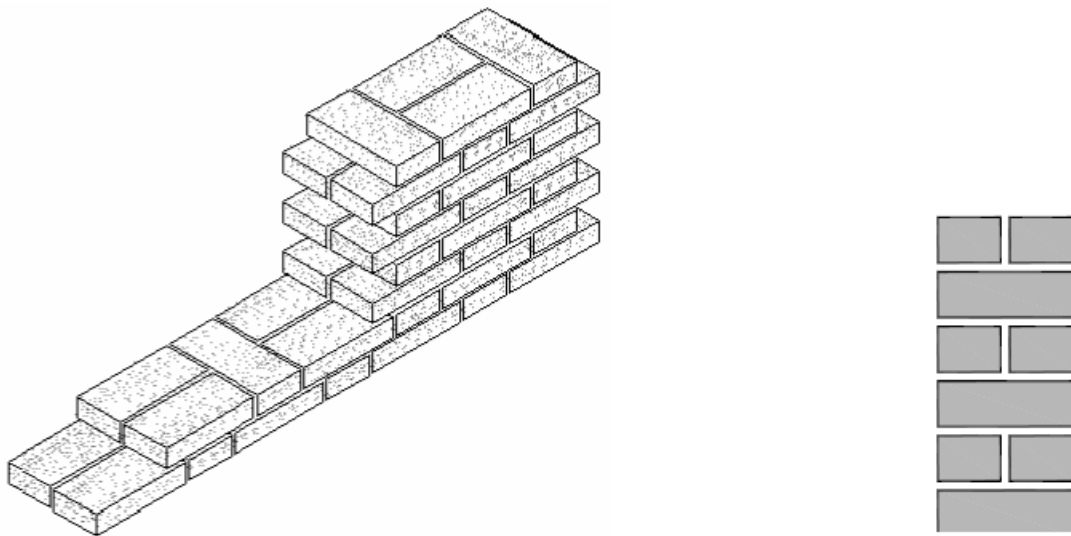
Sketch of the bond type adapted from Borri (2006) and sketch of the cross section view of the wall
